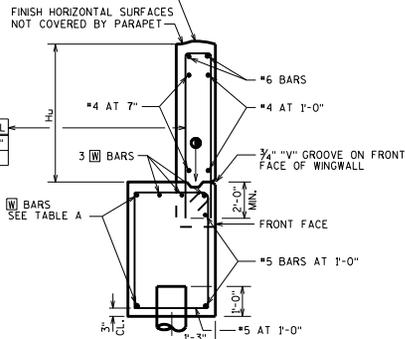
DETAIL FOR CONC. PARAPET WITH SIDEWALK SHOWN. SEE STD. 12.02 - "TOP OF WING DETAILS" FOR OTHER RAILING & PARAPET TREATMENTS.
